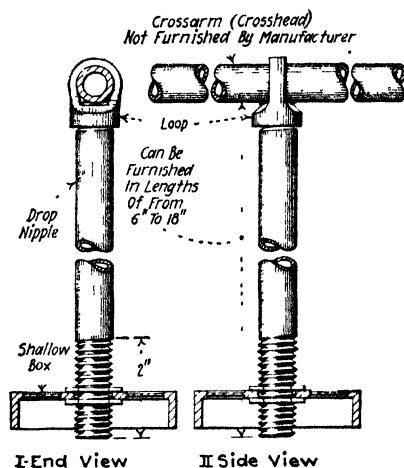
Outlet box hanger, for use where heavy loads are to be supported. (Patented by *The Thomas & Betts Company.*)
